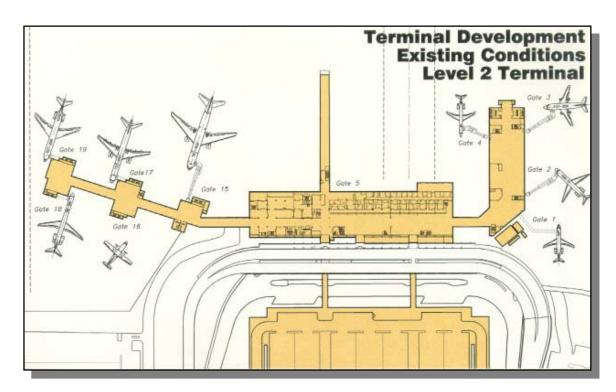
Terminal Second Floor – Ticketing/Gate Areas/Concessions
